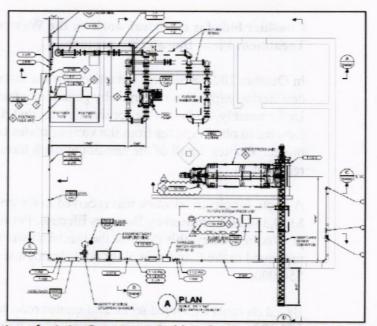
Plan view of existing Dewatering Building showing installed equipment and room for an additional train of dewatering equipment.
